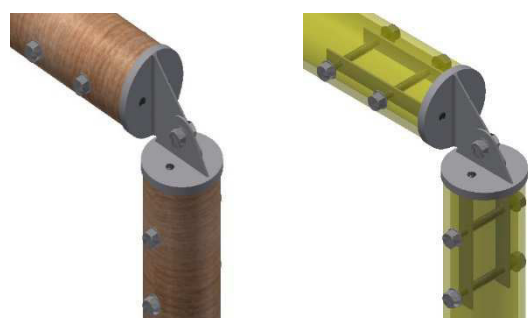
Bolted connection using plates and welded brackets.
